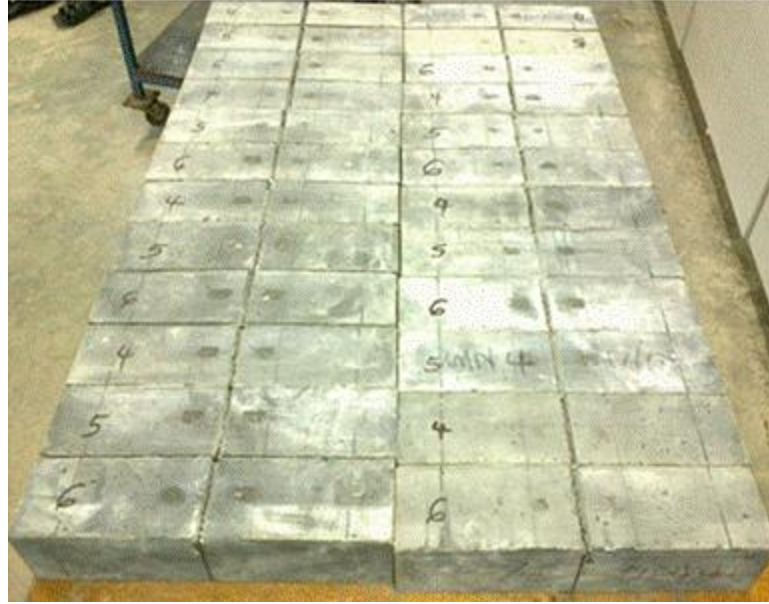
Notched flexural tensile (3-point) prism specimens after testing, showing crack in notches.
